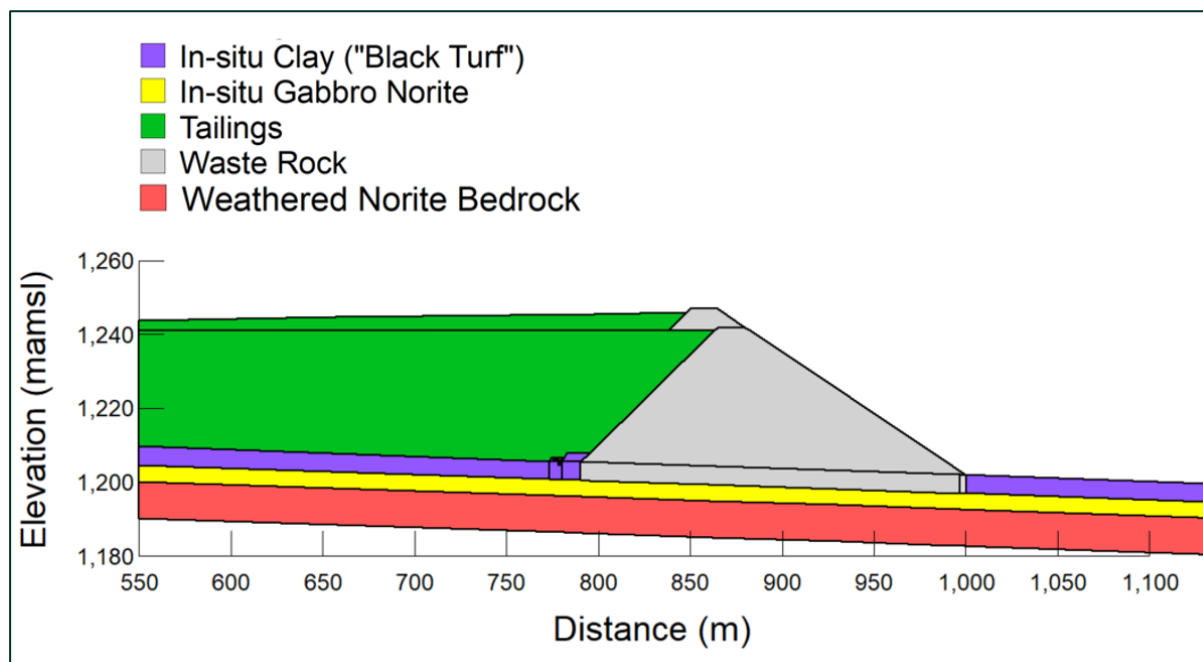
TSF 1 Expansion Western Embankment (section B-B)
